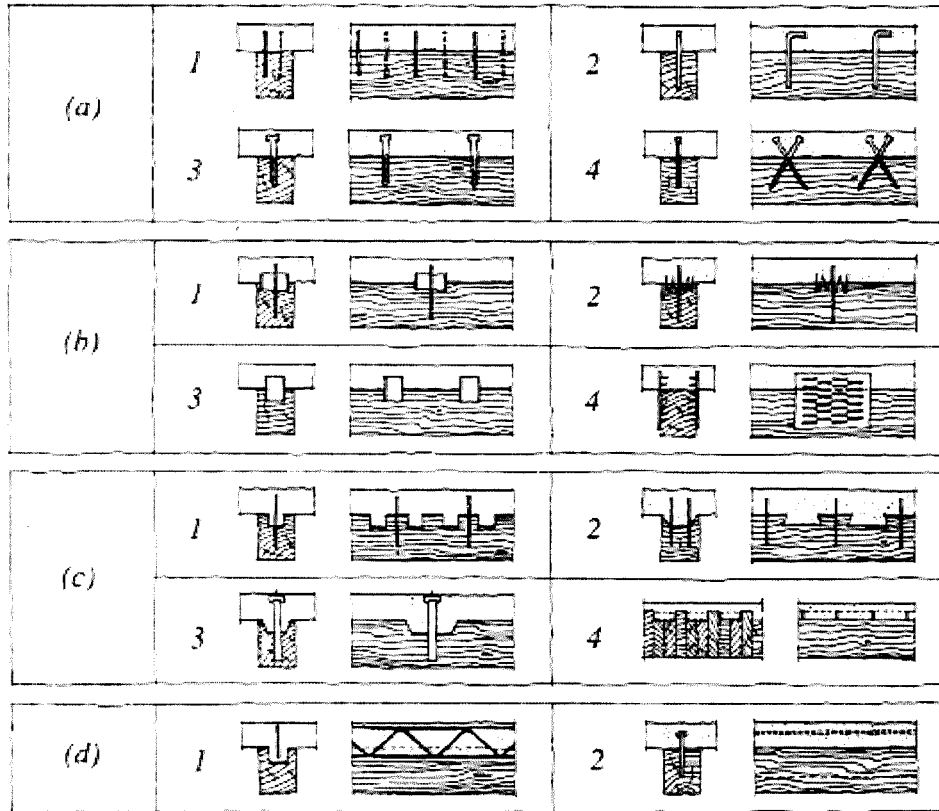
Examples of different types of timber-concrete connections (Ceccotti, 1995):
